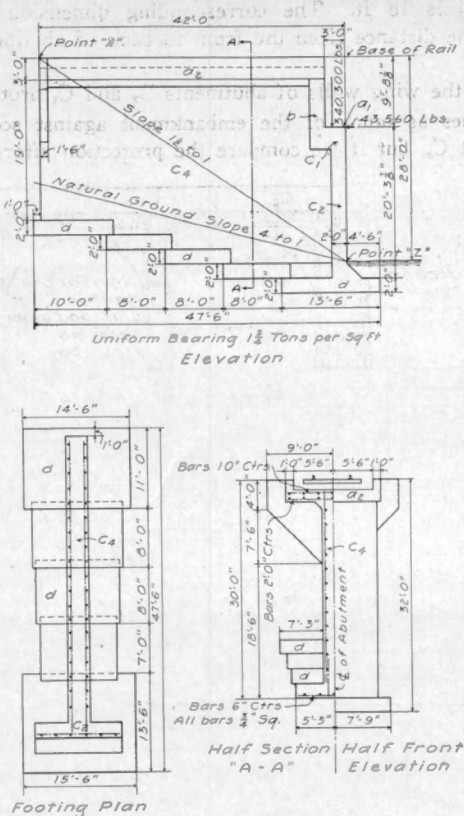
Type C₂; Reinforced Concrete Arch Abutment.
